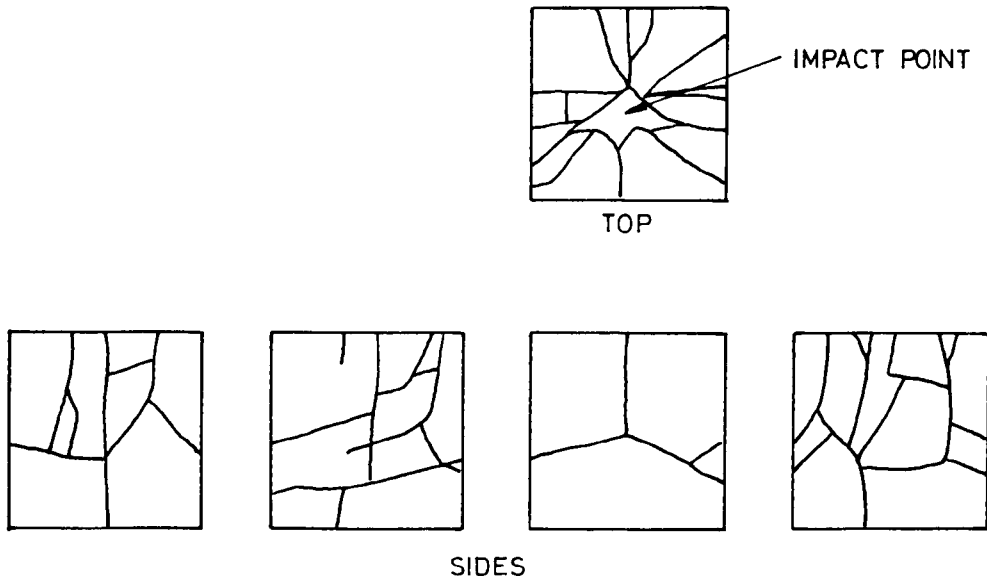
CRACKS IN A 380mm 'LYTAG' CONCRETE CUBE (43g SHAPED CHARGE JET IMPACT)
